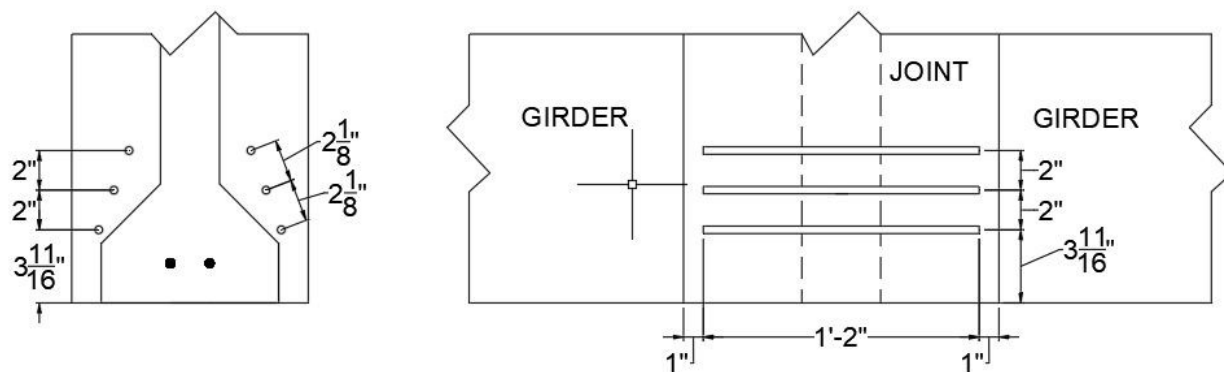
Retrofit continuity joint mild steel detail for positive moment.
